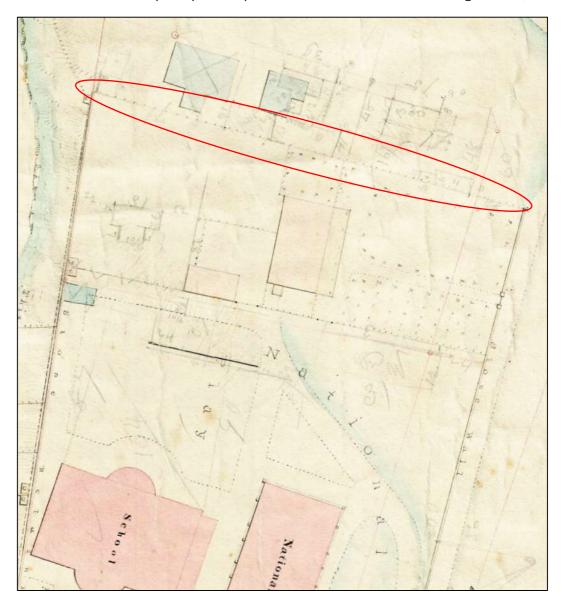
1856 Plan showing stone wall to east and west of national school (former military) compound.
